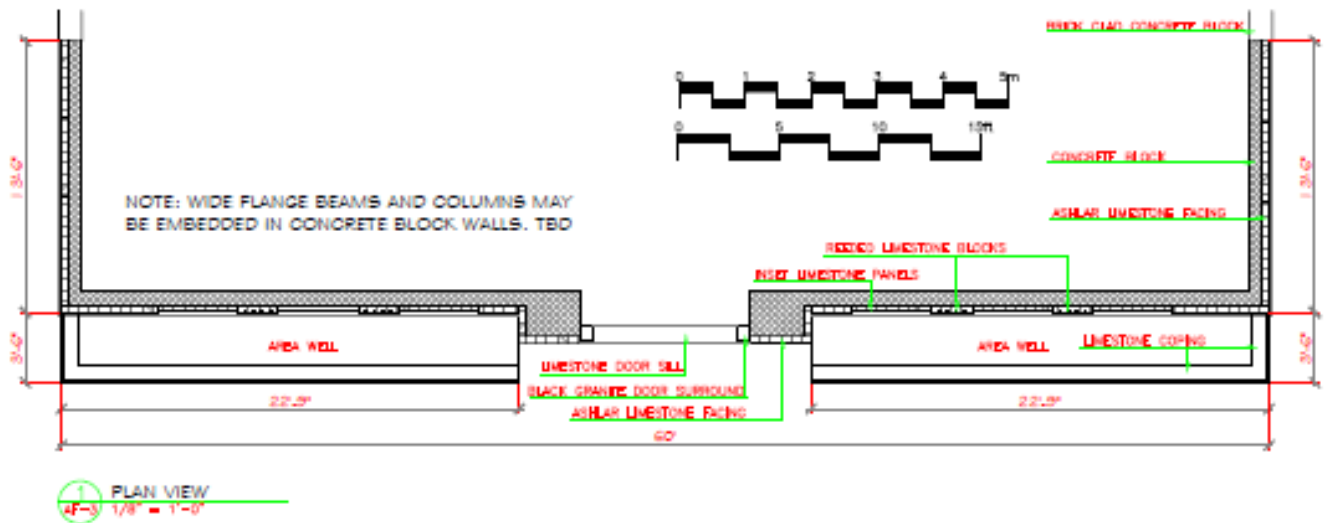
Plan As-Found drawing AF3 credit: Commonwealth.
